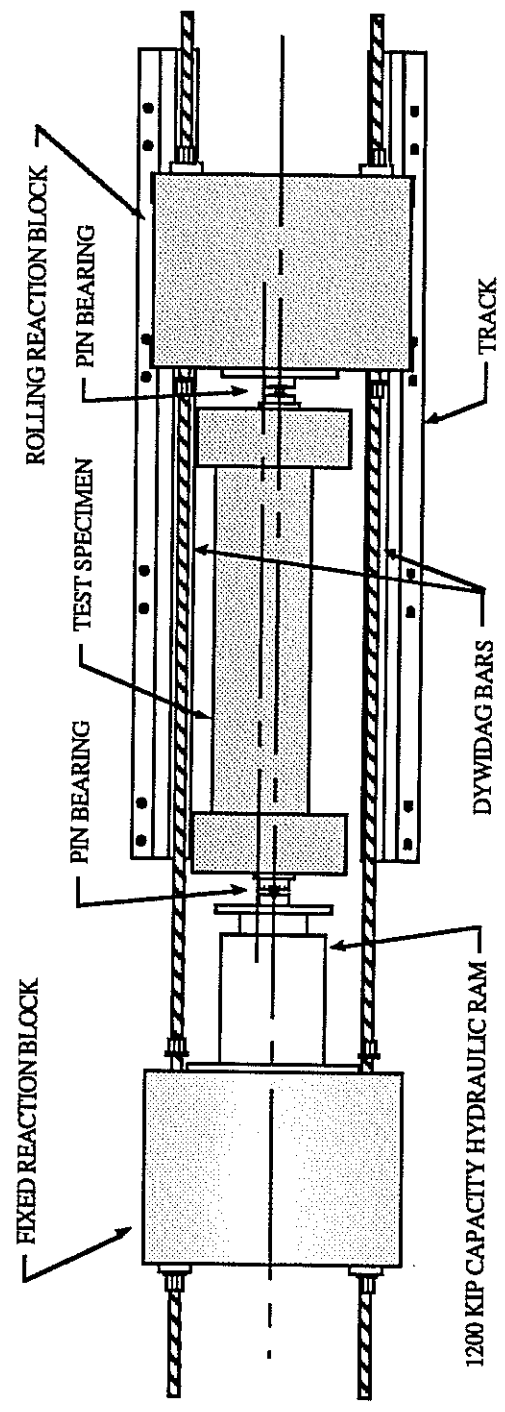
1200 kip Capacity Test Machine, Top View
